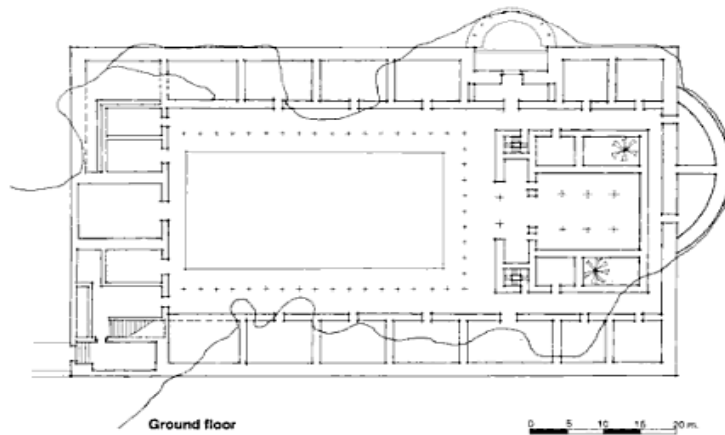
Reconstructed plan of the Promontory Palace, ground floor. West to right. All drawings and plans are by the author
